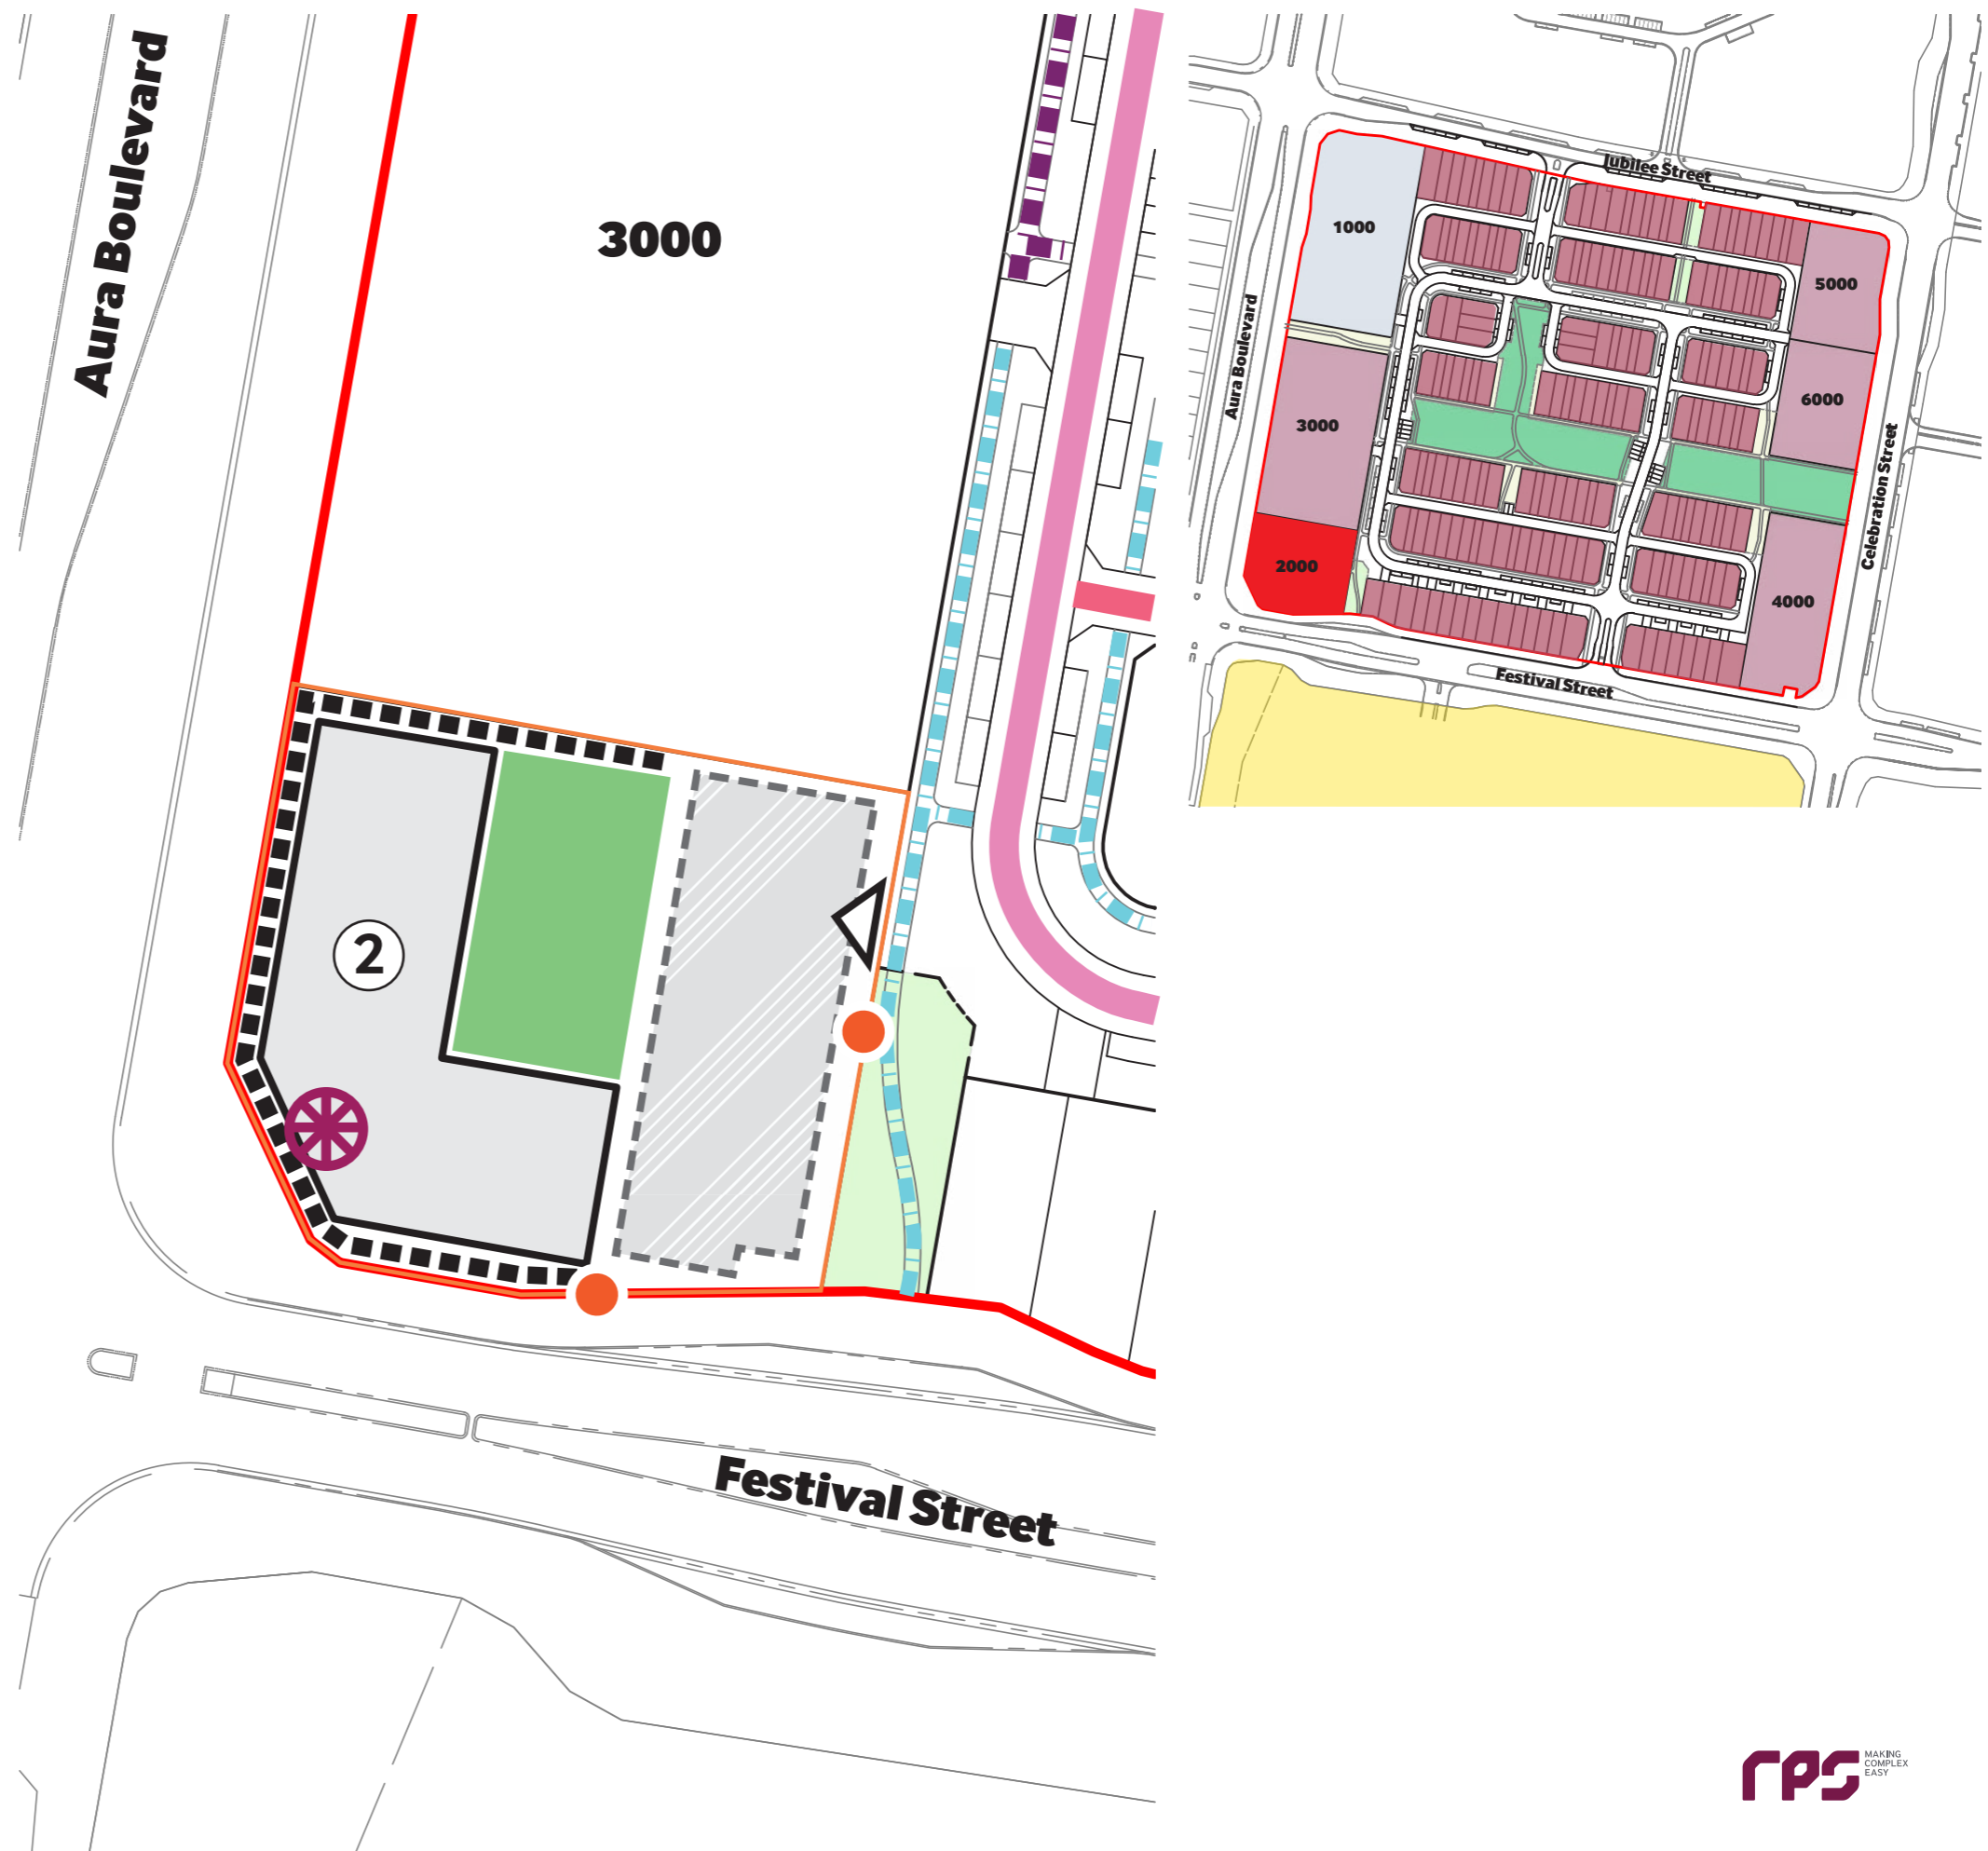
SUB-PRECINCT 9.1B NON-RESIDENTIAL USES PLAN - PLAN OF DEVELOPMENT
